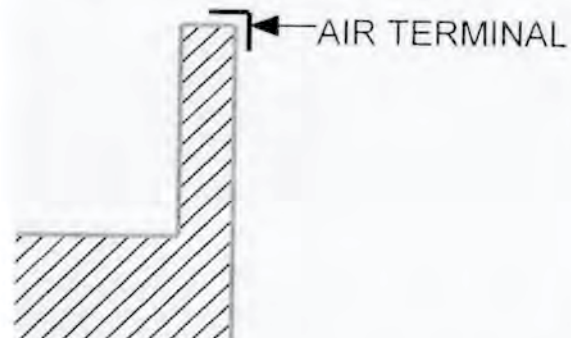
L-shape cross-section of air terminal for the protection of parapet walls and roof edges.
